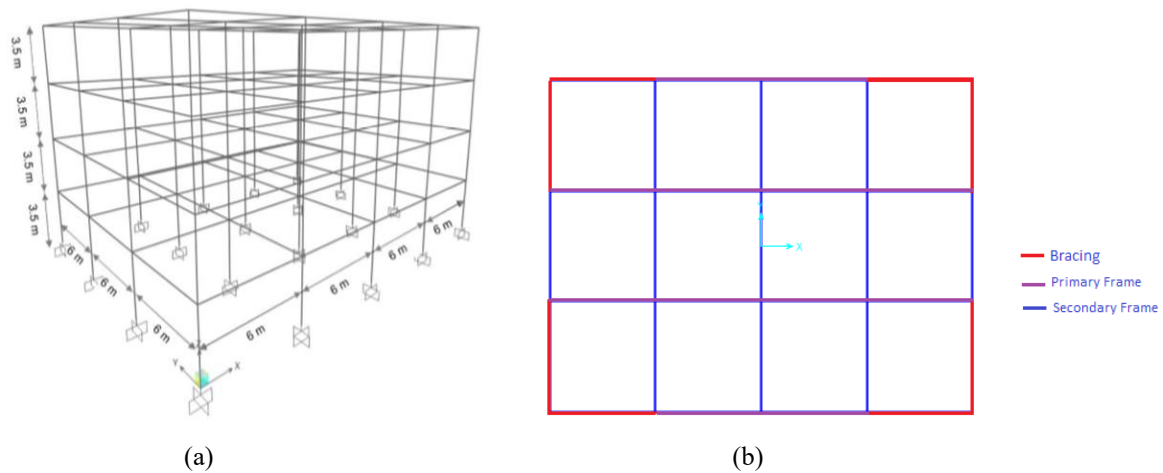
(a) Reference 3D-Steel Structure of Office Building, and (b) Plan view of the 3D structure
